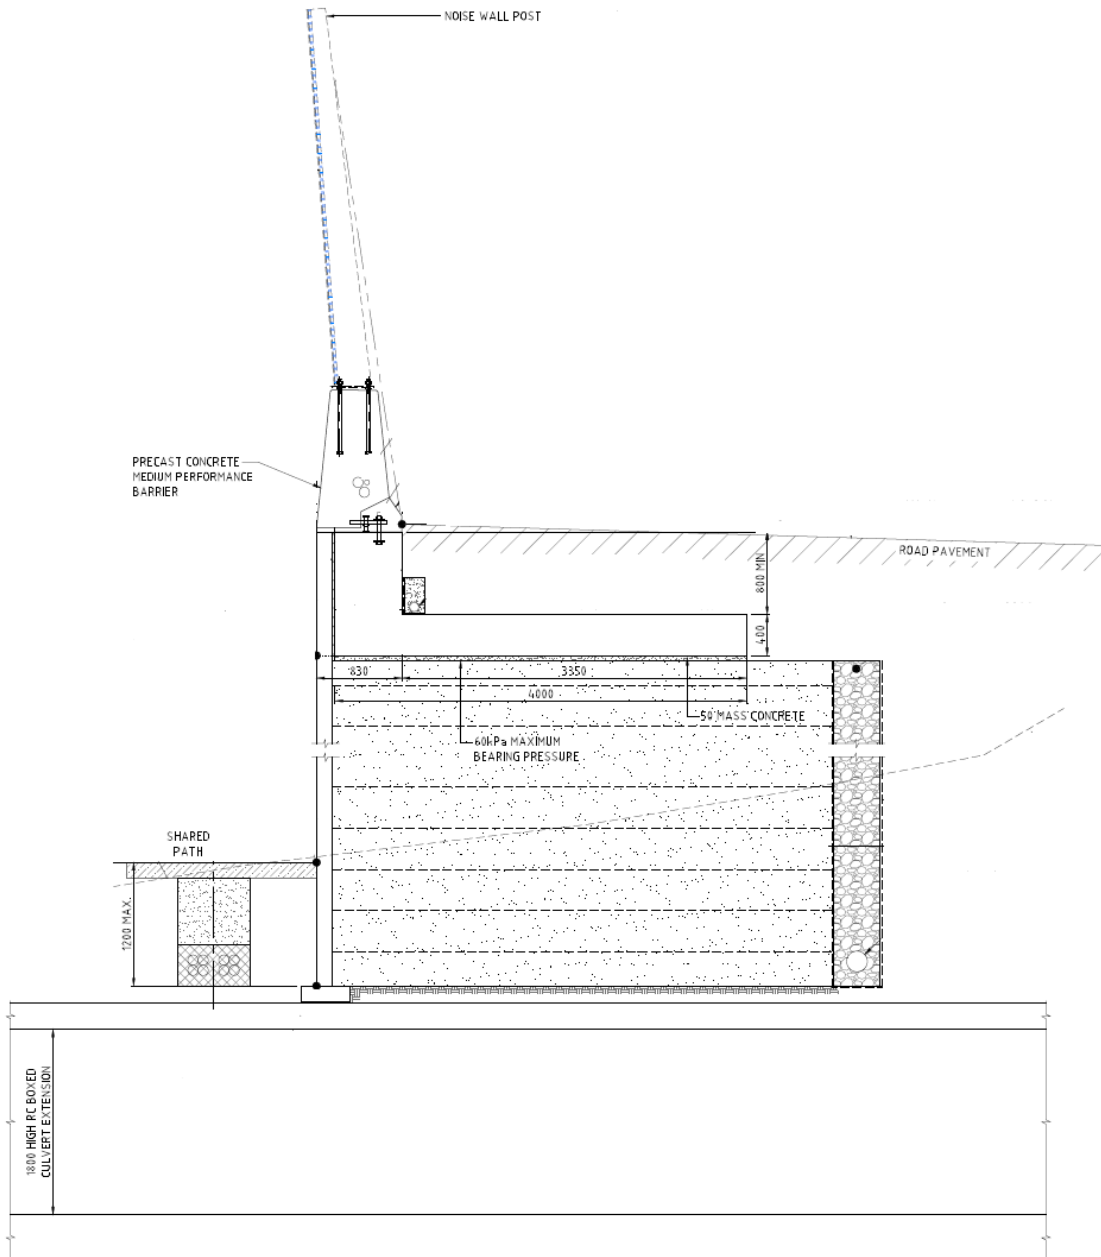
Noise Wall 1 (Figure 1 cross section – NW1 – XS1)
